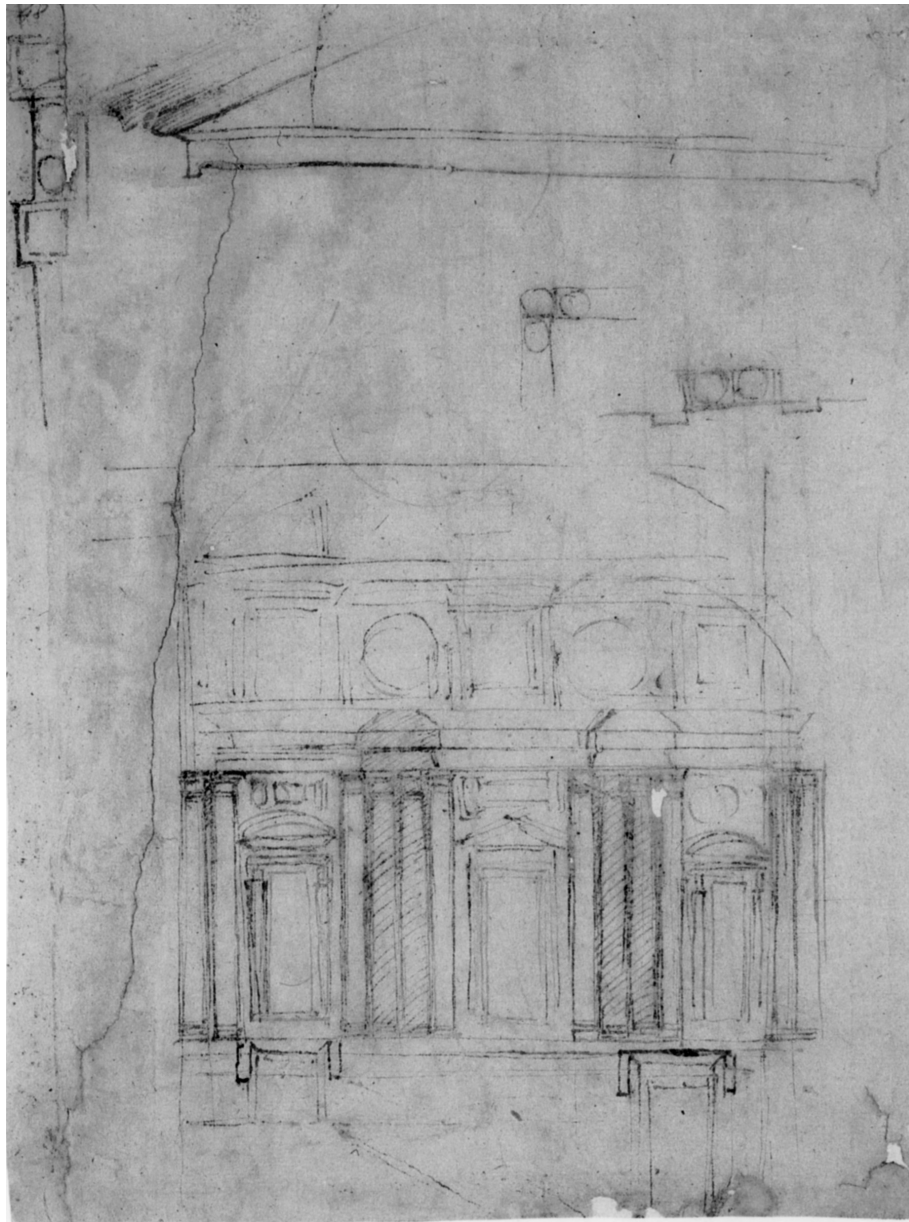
Michelangelo, Casa Buonarroti 48A recto, 1525, elevation study for the west wall of the Laurentian Library *ricetto*, and plan details with paired, recessed columns flanked by full pilasters (upper right corner)
